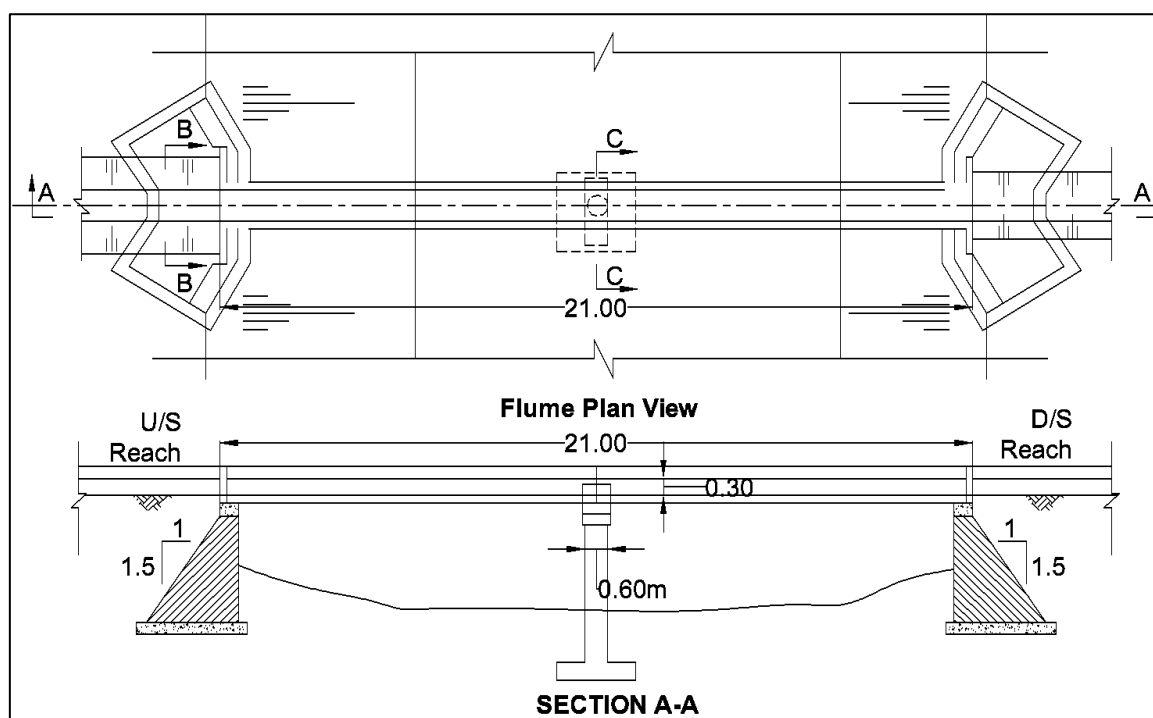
Flume Plan and sectional view (flume support Pier at mid span)
